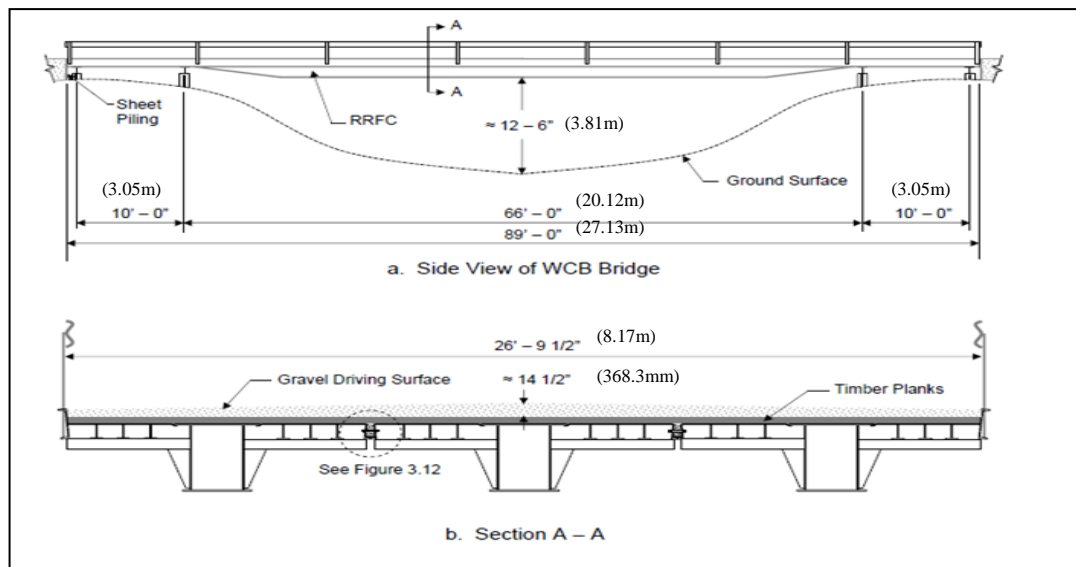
Multi-span bridge layout (Massa, 2008)
